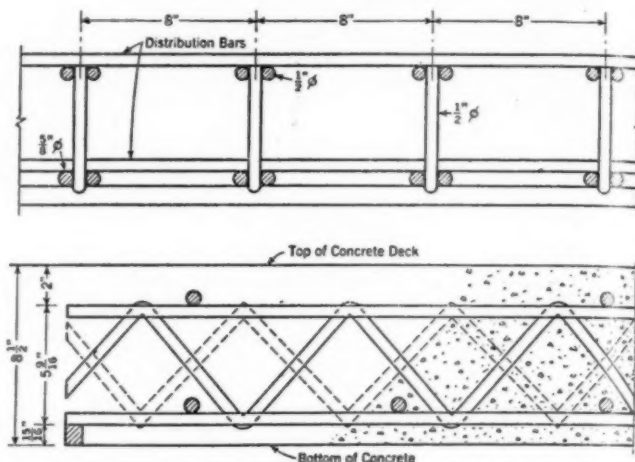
Cross Section of Types of Floor Slabs for Roadway Surfaces.
